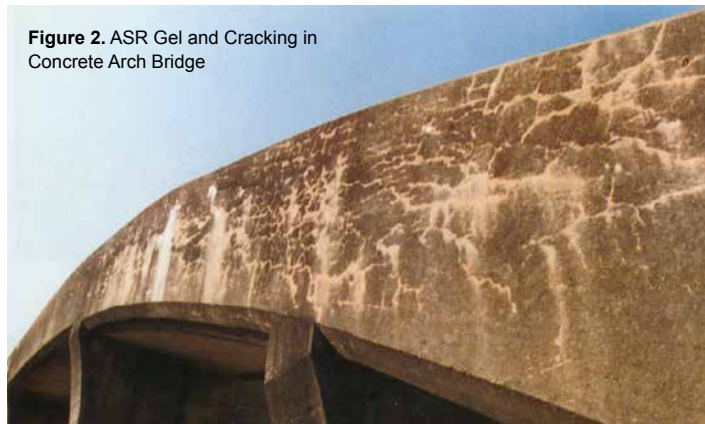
ASR Gel and Cracking in Concrete Arch Bridge
